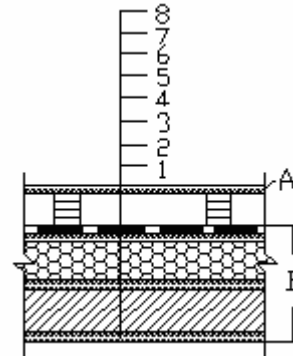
the configuration of basic ventilated roof in Changsha (1. reinforced concrete hollow slab with inside stucco 2. cement layer 3. vapor barrier 4. insulation material 5.cement layer 6. waterproof 7. air gap 8.concrete slab with its outside surface painted by white cement)
